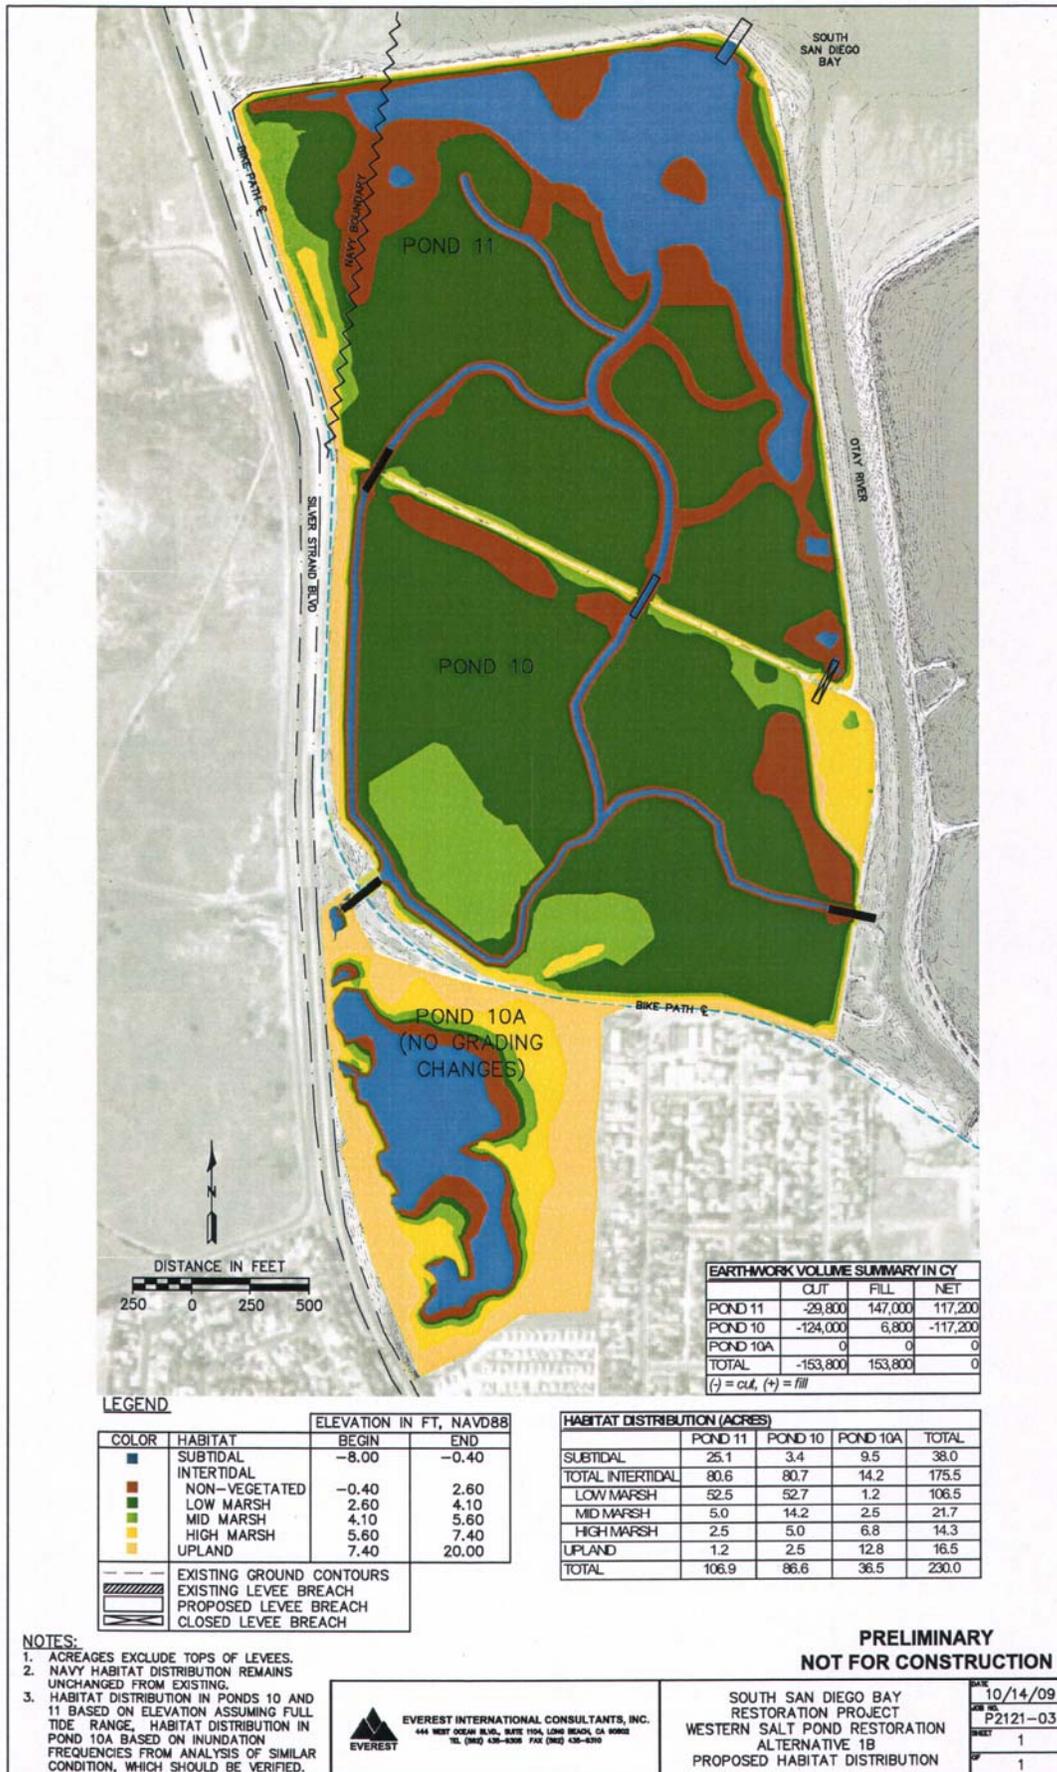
Restoration Plan for Western Salt Ponds (Alternative 1B, No Import Alternative)
